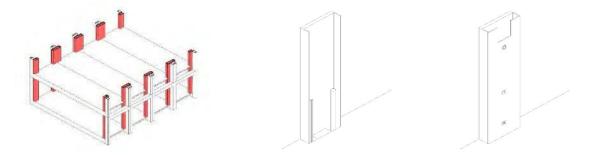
Initial concept of potentializing the existing frame of the building by introducing series of vertical shafts in the Circular Retrofit Lab
